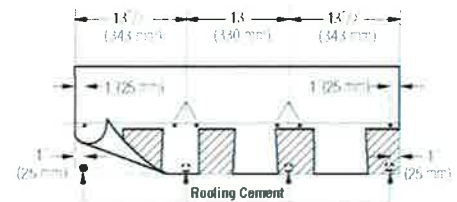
Use six nails and four spots of asphalt roofing cement on steep slopes.
